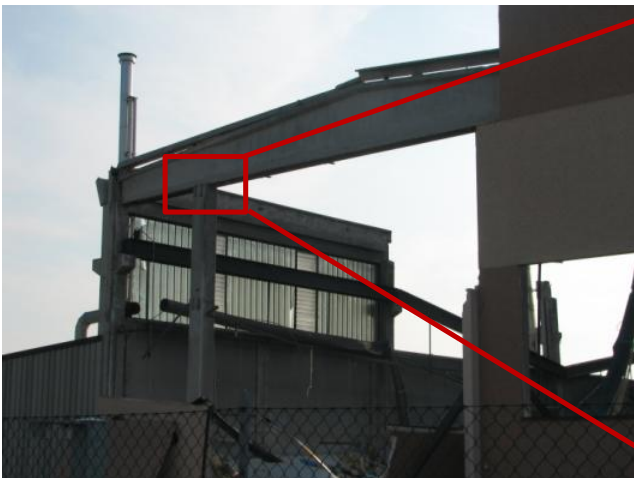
Beam-column connection without sufficient reinforcement in the beam head
